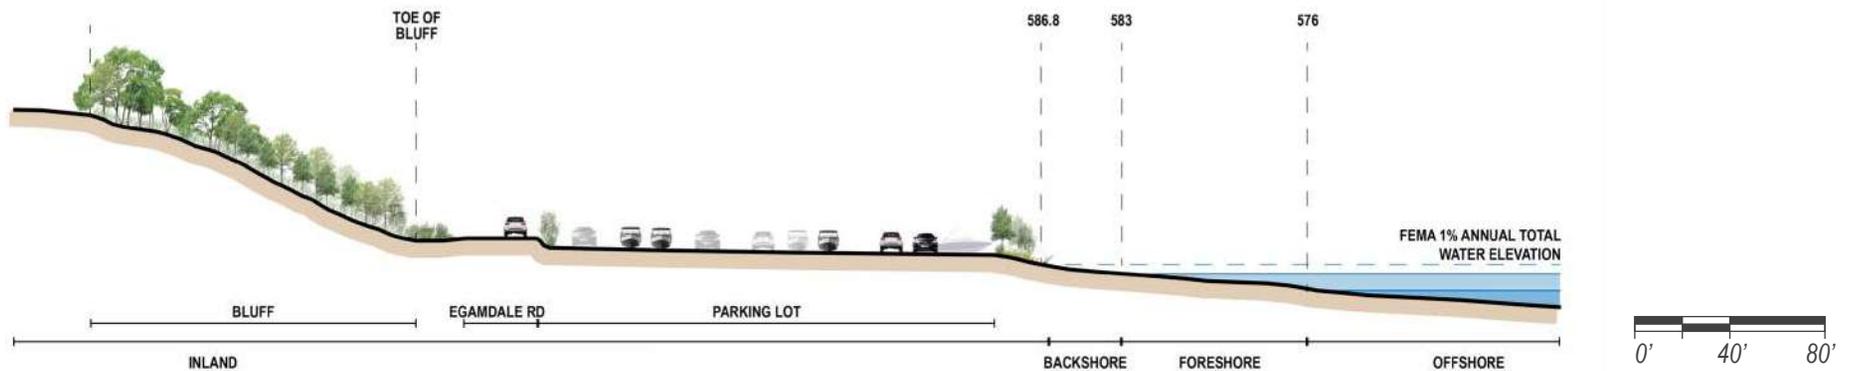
Cross Section of North Beach at Park Avenue Boating Facility
